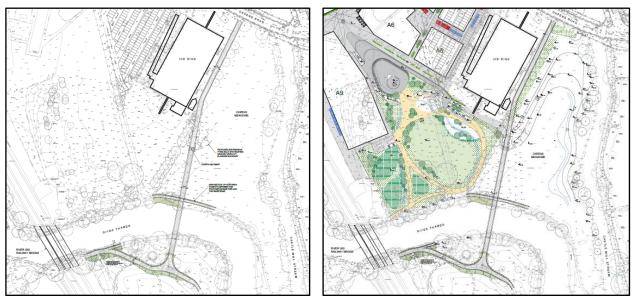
Proposed Bridge General Arrangement - in isolation (left) and within the Oxpens Masterplan (right)
